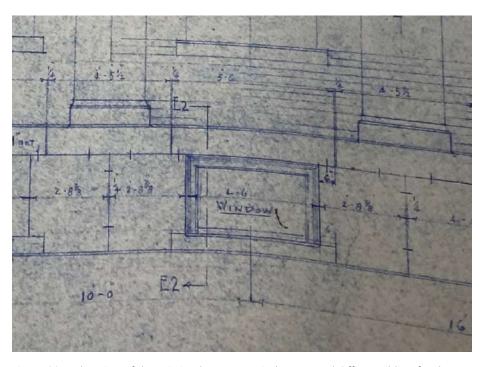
Elevation of the existing basement windows. (Head Office Building for the Economical Mutual Fire Insurance Company, Mathers & Haldenby Architects, November 1949)
